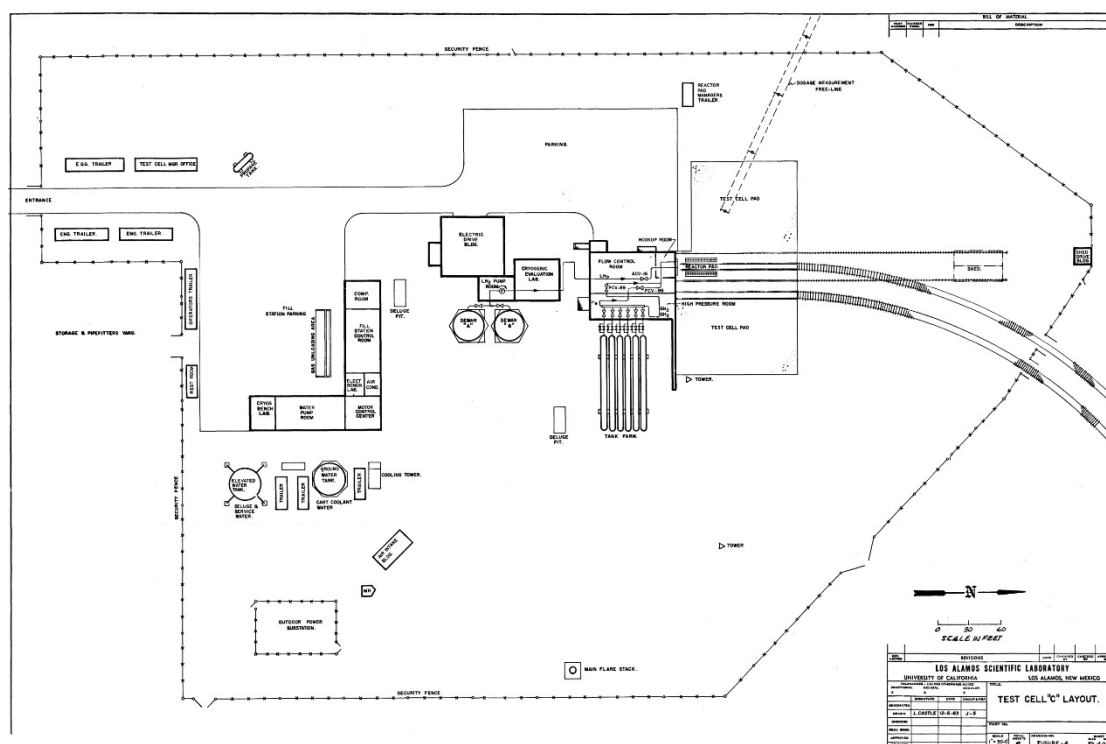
Plan of Test Cell C in 1963 (detail from Los Alamos Scientific Laboratory drawing Test Cell “C” Layout, Drawing No. SK-169 J-5, Sheet 4 of 8, 1963).
